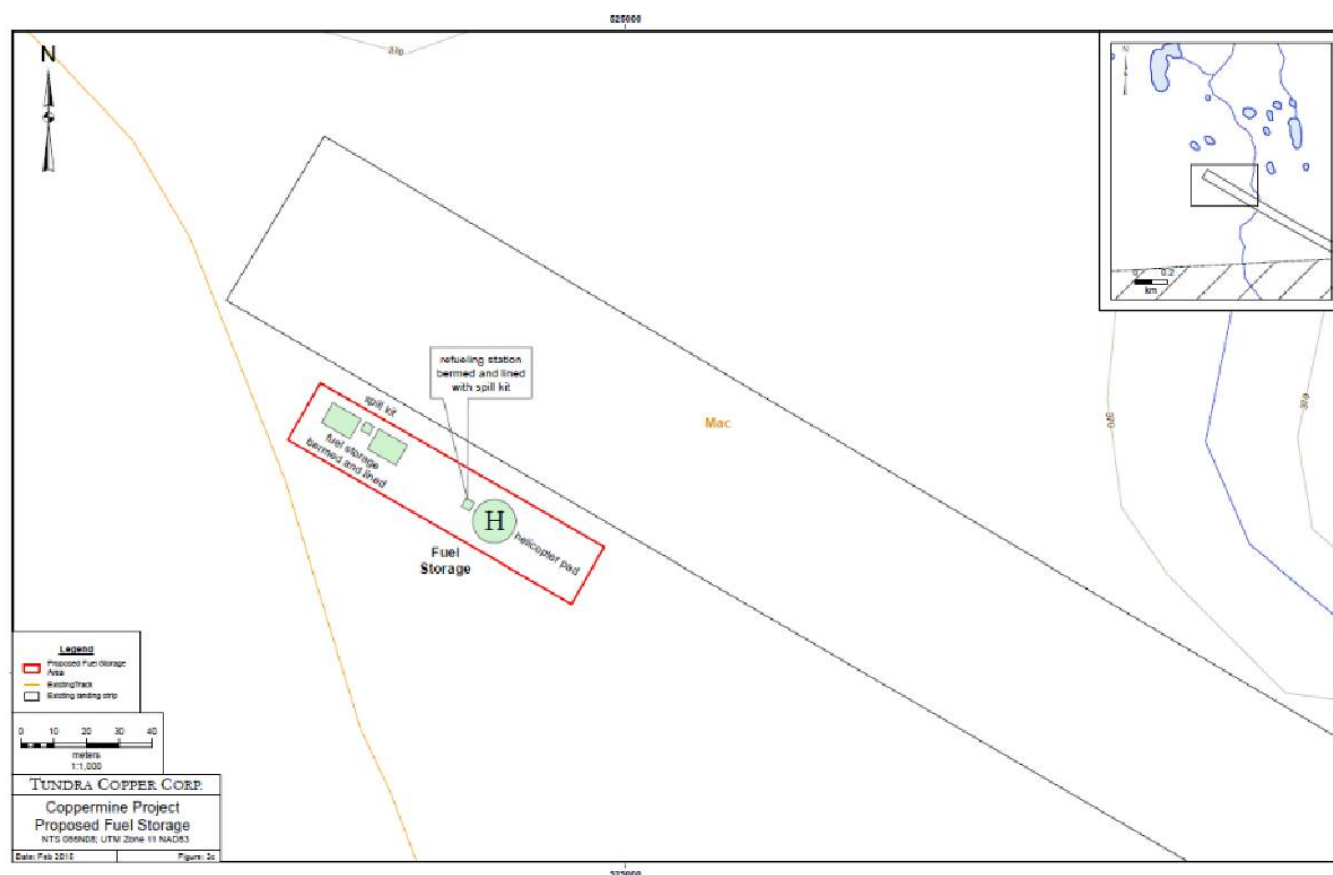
Proposed fuel storage at the Hope Lake camp site, 2026.
